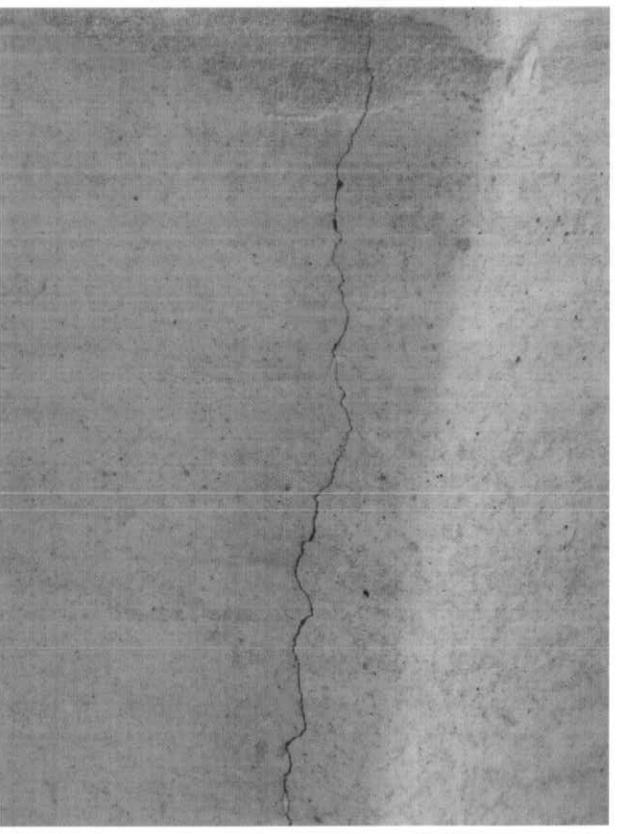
CLOSEUP OF HORIZONTAL CRACKING IN BOTTOM FASCIA OF GIRDERS IN SPAN # 2.
